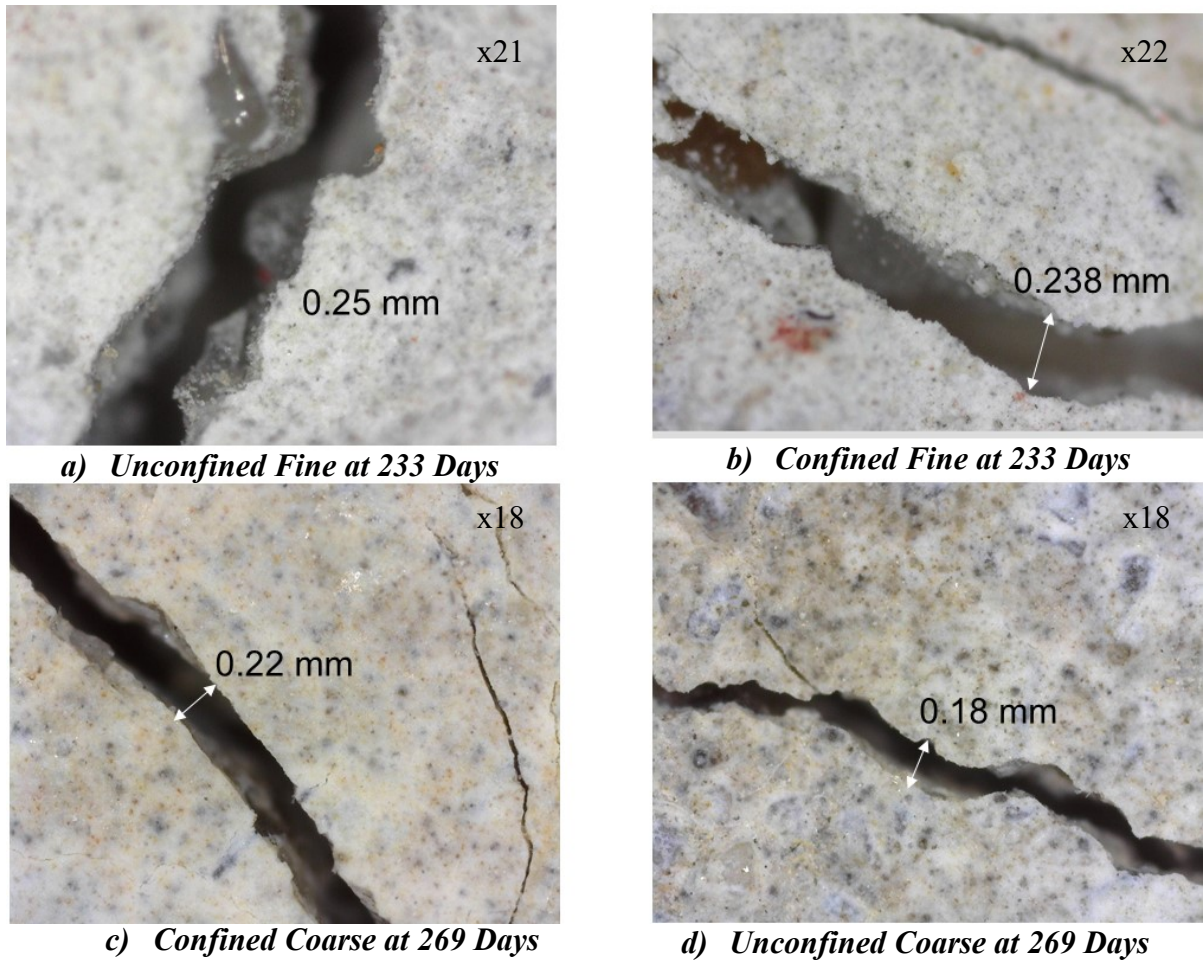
Examples of Cracks on Concrete Surfaces
